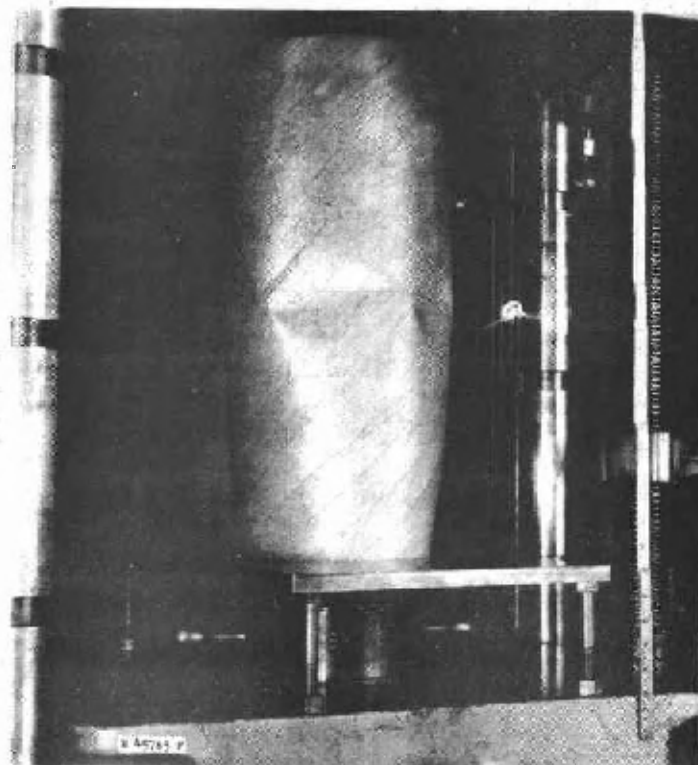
Typical failure of a thin-walled barrel-shaped plywood specimen showing buckles at mid-length.
